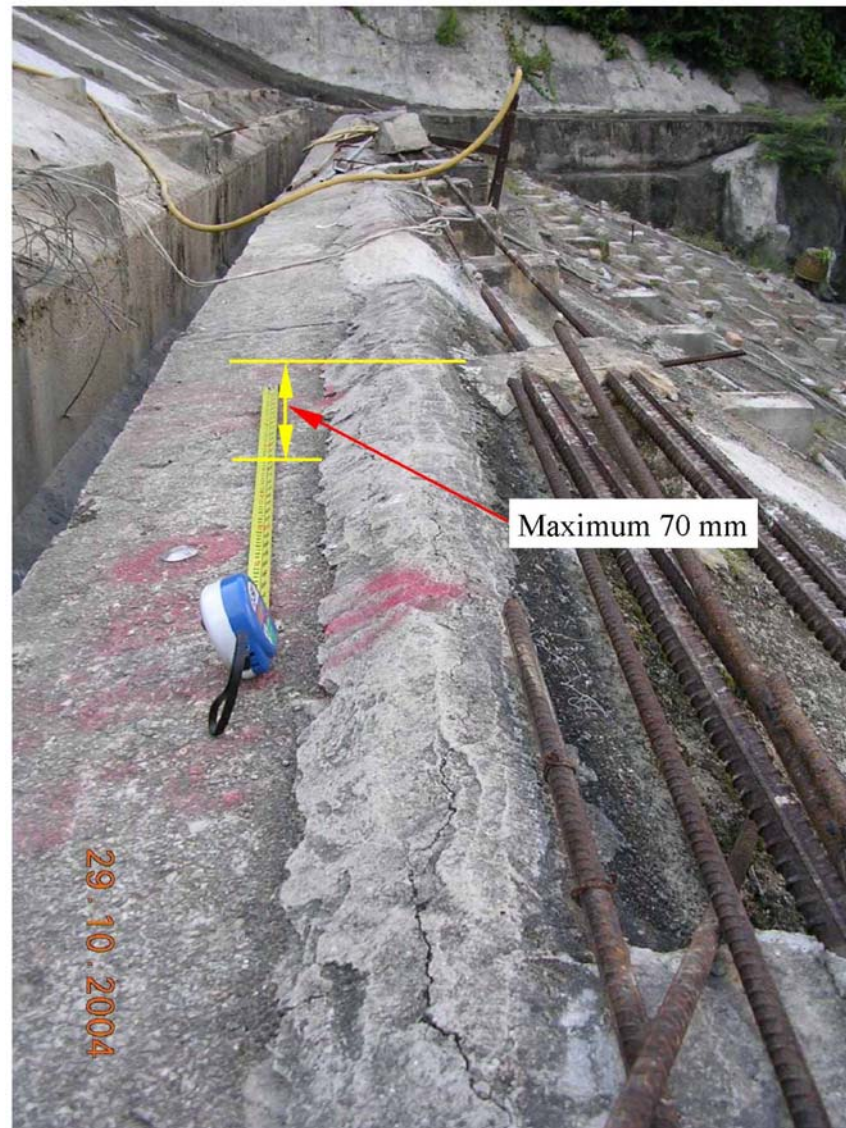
Lip Formed at Crest of First Batter above Slope Toe through Differential Movement between Shotcrete and Berm Slab
